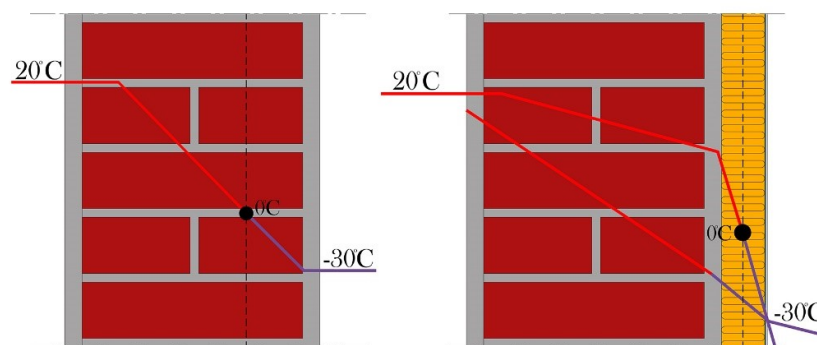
With the application of Adingterm system the cold air is kept outside and the heat inside²
